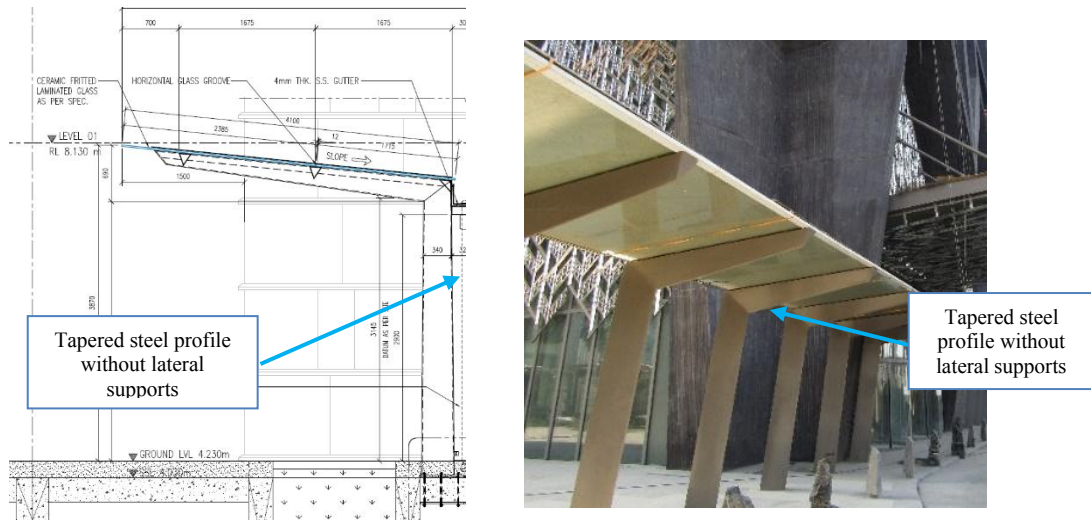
Glass canopy supported with steel structure-Actual site installation view
